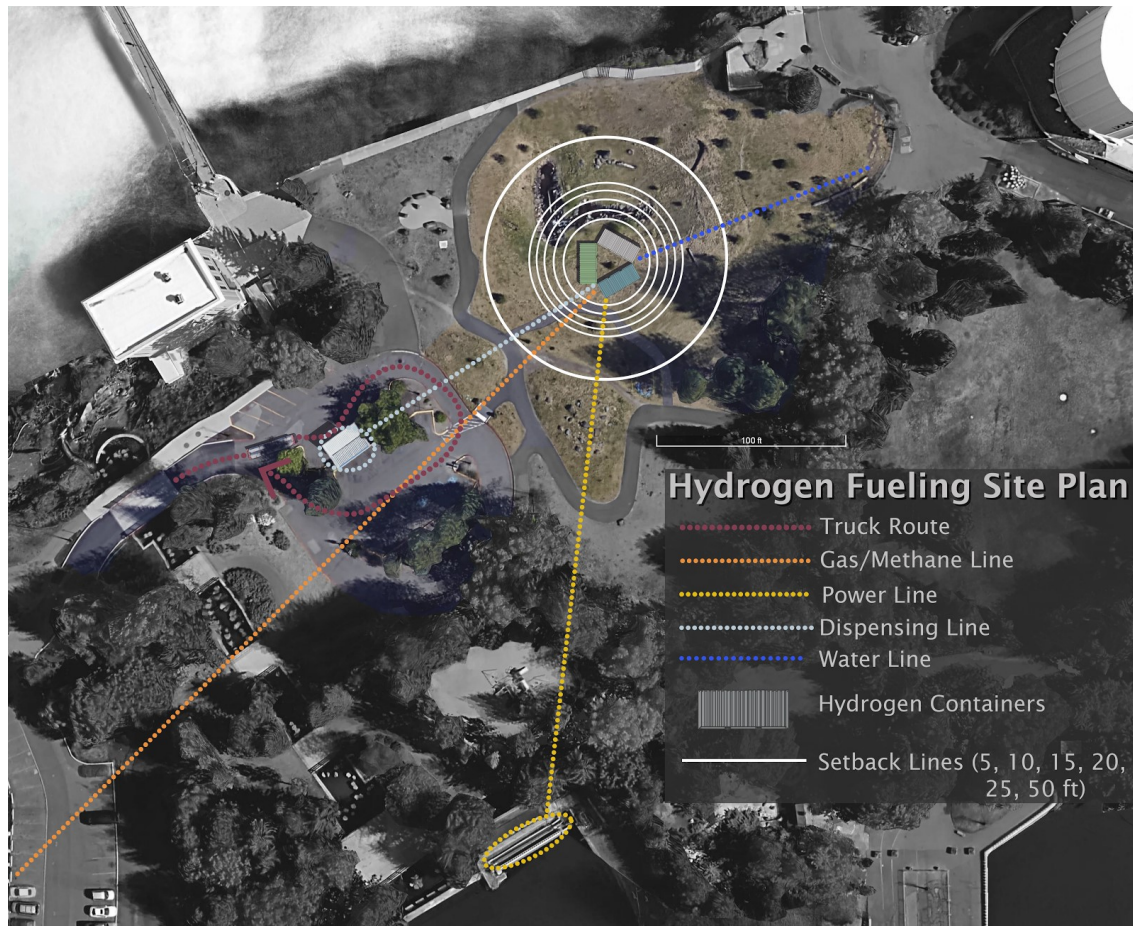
Site layout on the Riverfront Park grounds showing setback distances surrounding the P2G station.
